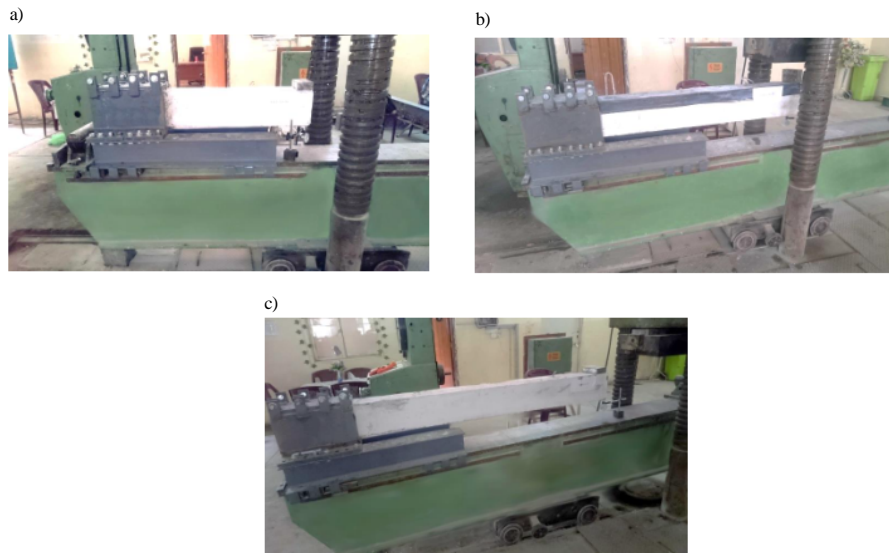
Setting up of different length of cantilever beam fixed steel support setup; a) Setting up RC cantilever beam of 1.1 m with normal concrete; b) Setting up RC cantilever beam of 1.6 m with normal concrete and CFRP sheet and c) Setting up RC cantilever beam of 2.1 m with normal concrete
